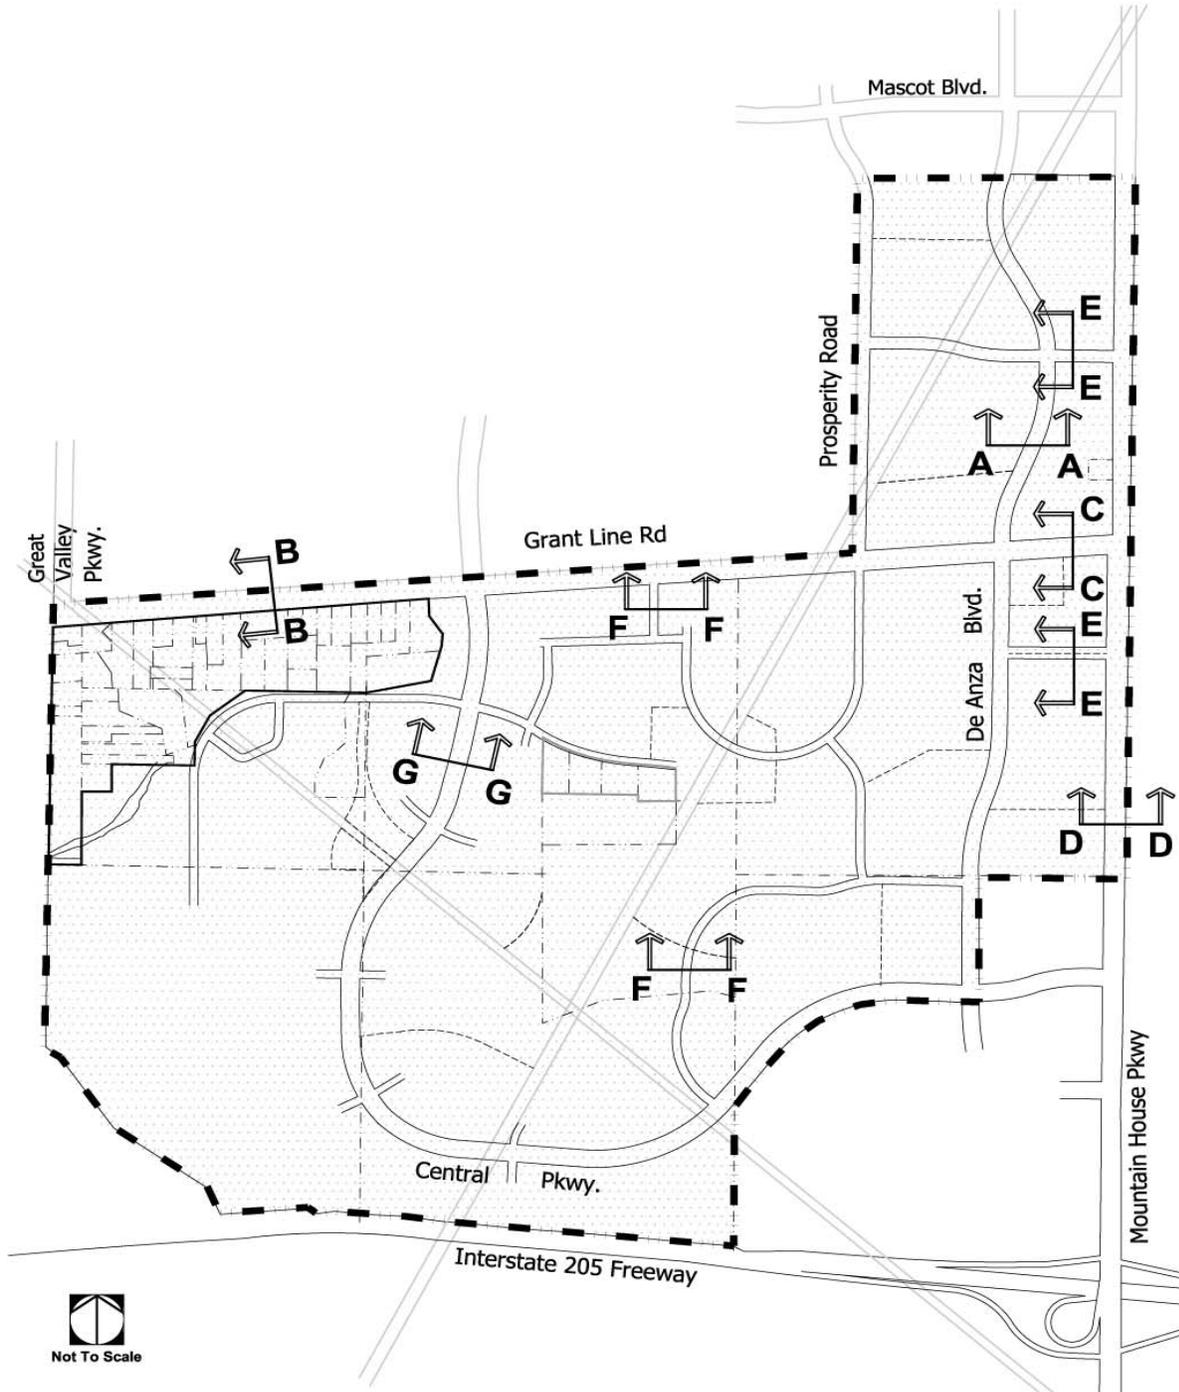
ROADWAY CROSS SECTION KEY MAP
